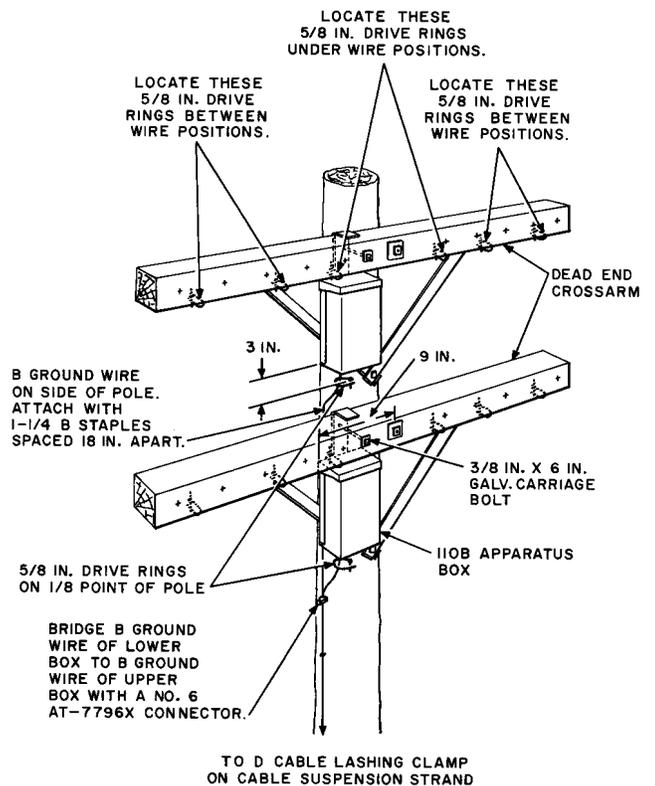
Installing 110B Apparatus Box at Open Wire and Cable Junction
